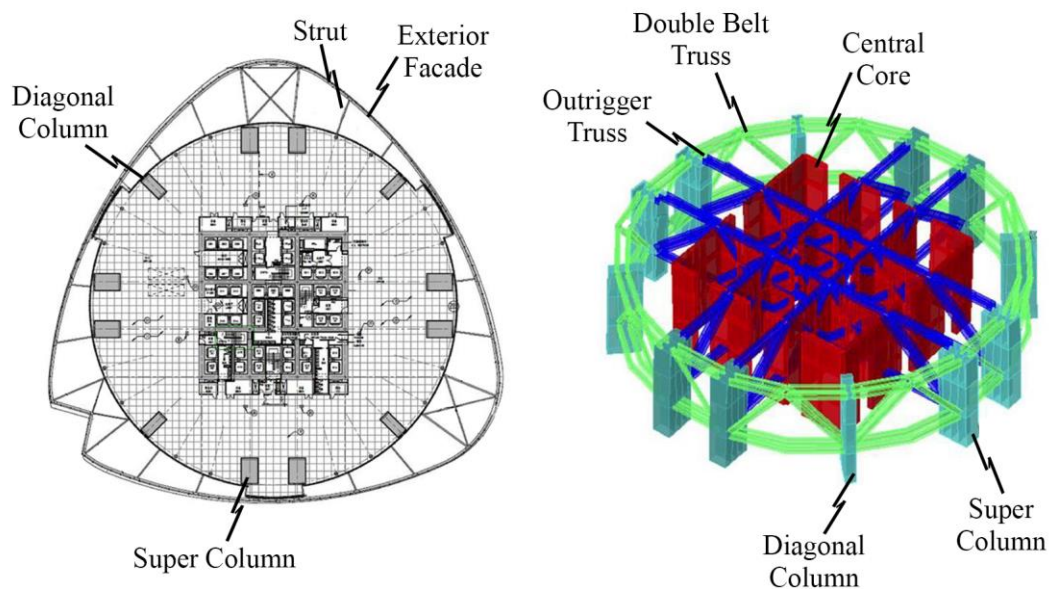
Shanghai Tower; typical floor plan (on left) and components of lateral structural system (on right) (Zhu et. al., 2012)
